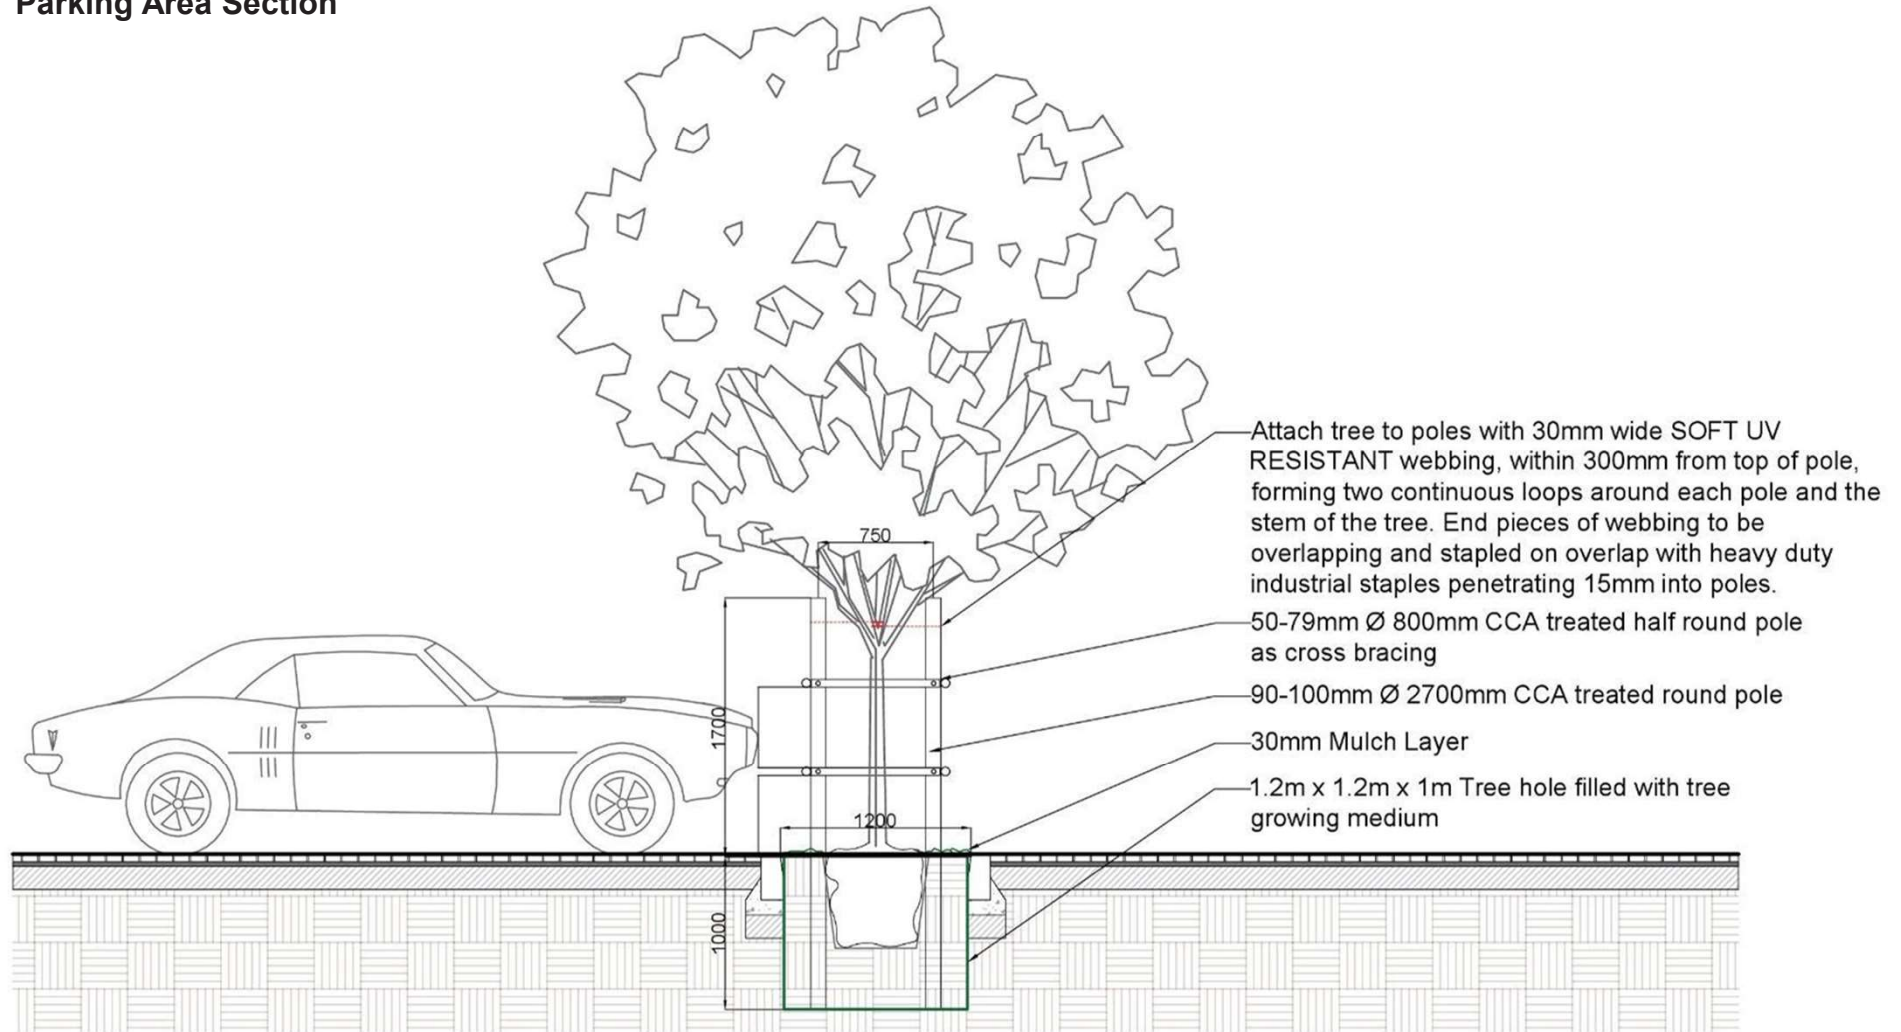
Parking Area Tree Detail Section (Viridian Consulting, 2024)
